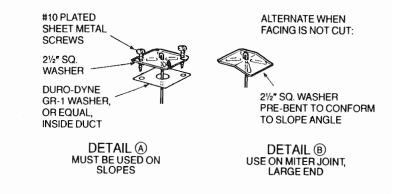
TRANSITION REINFORCEMENT, SLOPING SECTION
